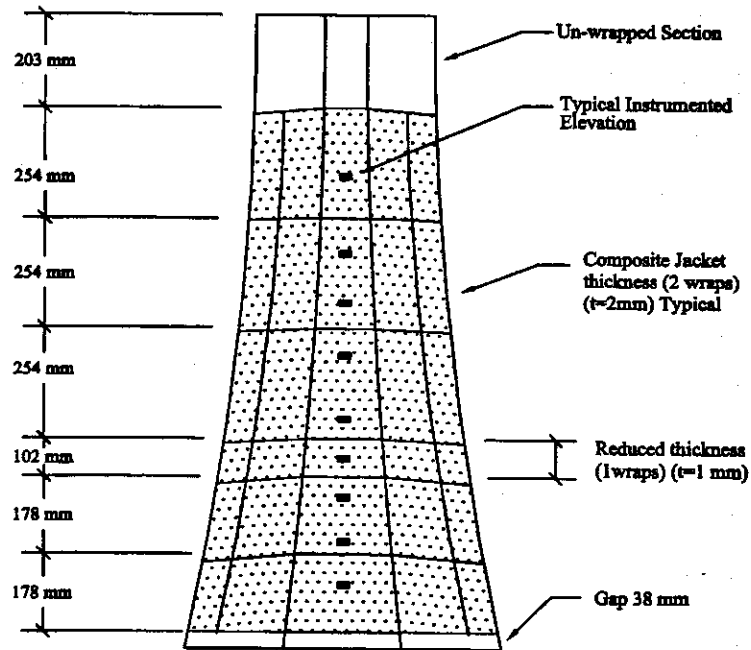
10 Elevation of FRC Jacketed Test Specimen
